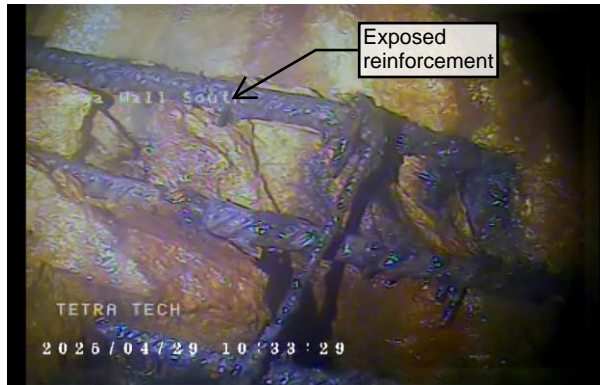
Exposed reinforcing steel on sheet pile cap.
